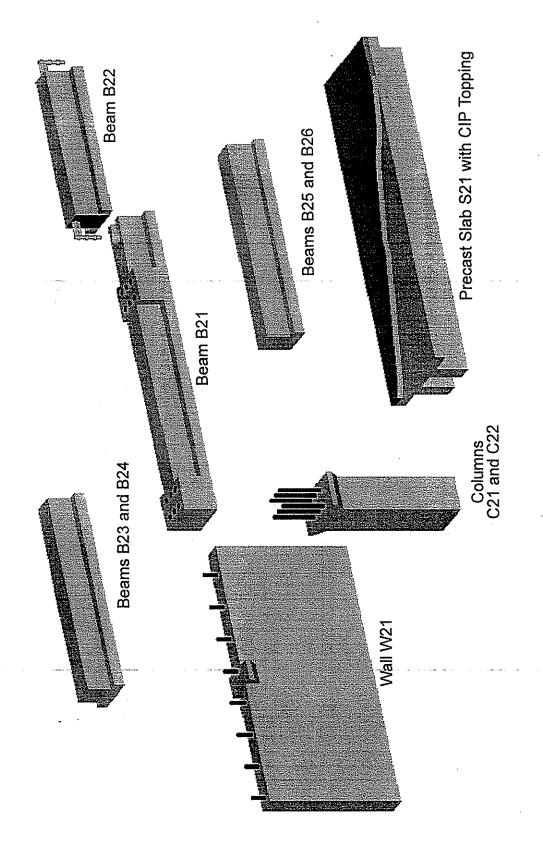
Typical Shape of Precast Members for the Demonstration Struture Using 2D-APC System
